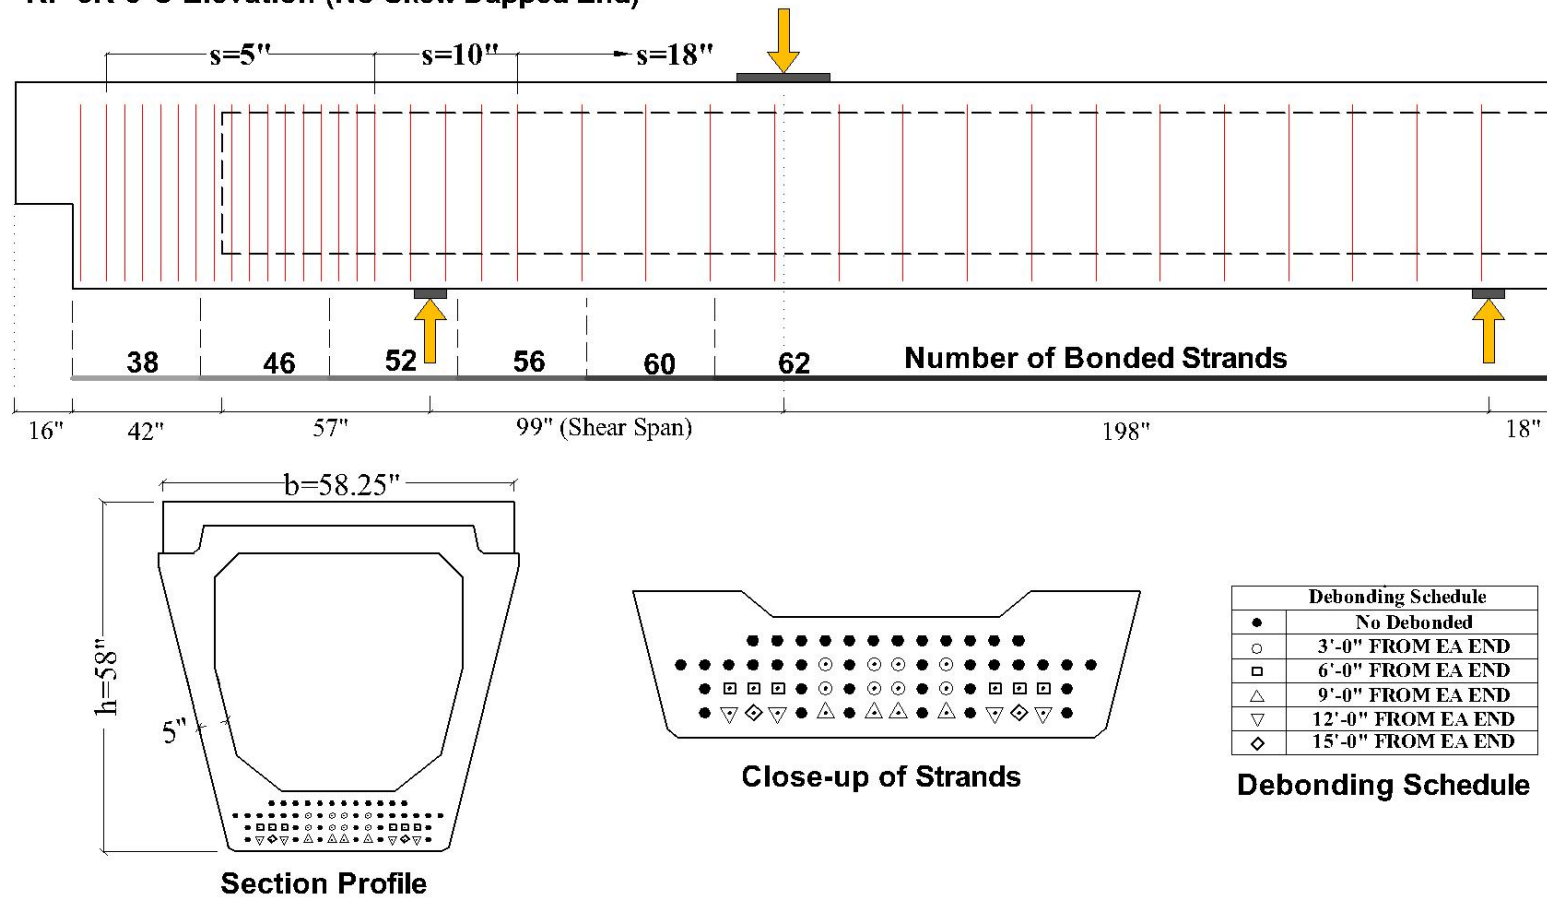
RF-3R-9-C elevation, cross section, and debonding schedule
